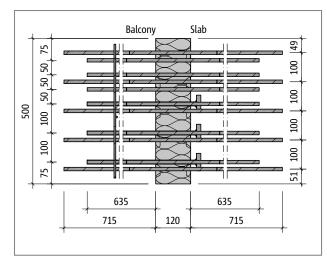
Schöck Isokorb® XT type C-L-M2-V2: Product plan view
